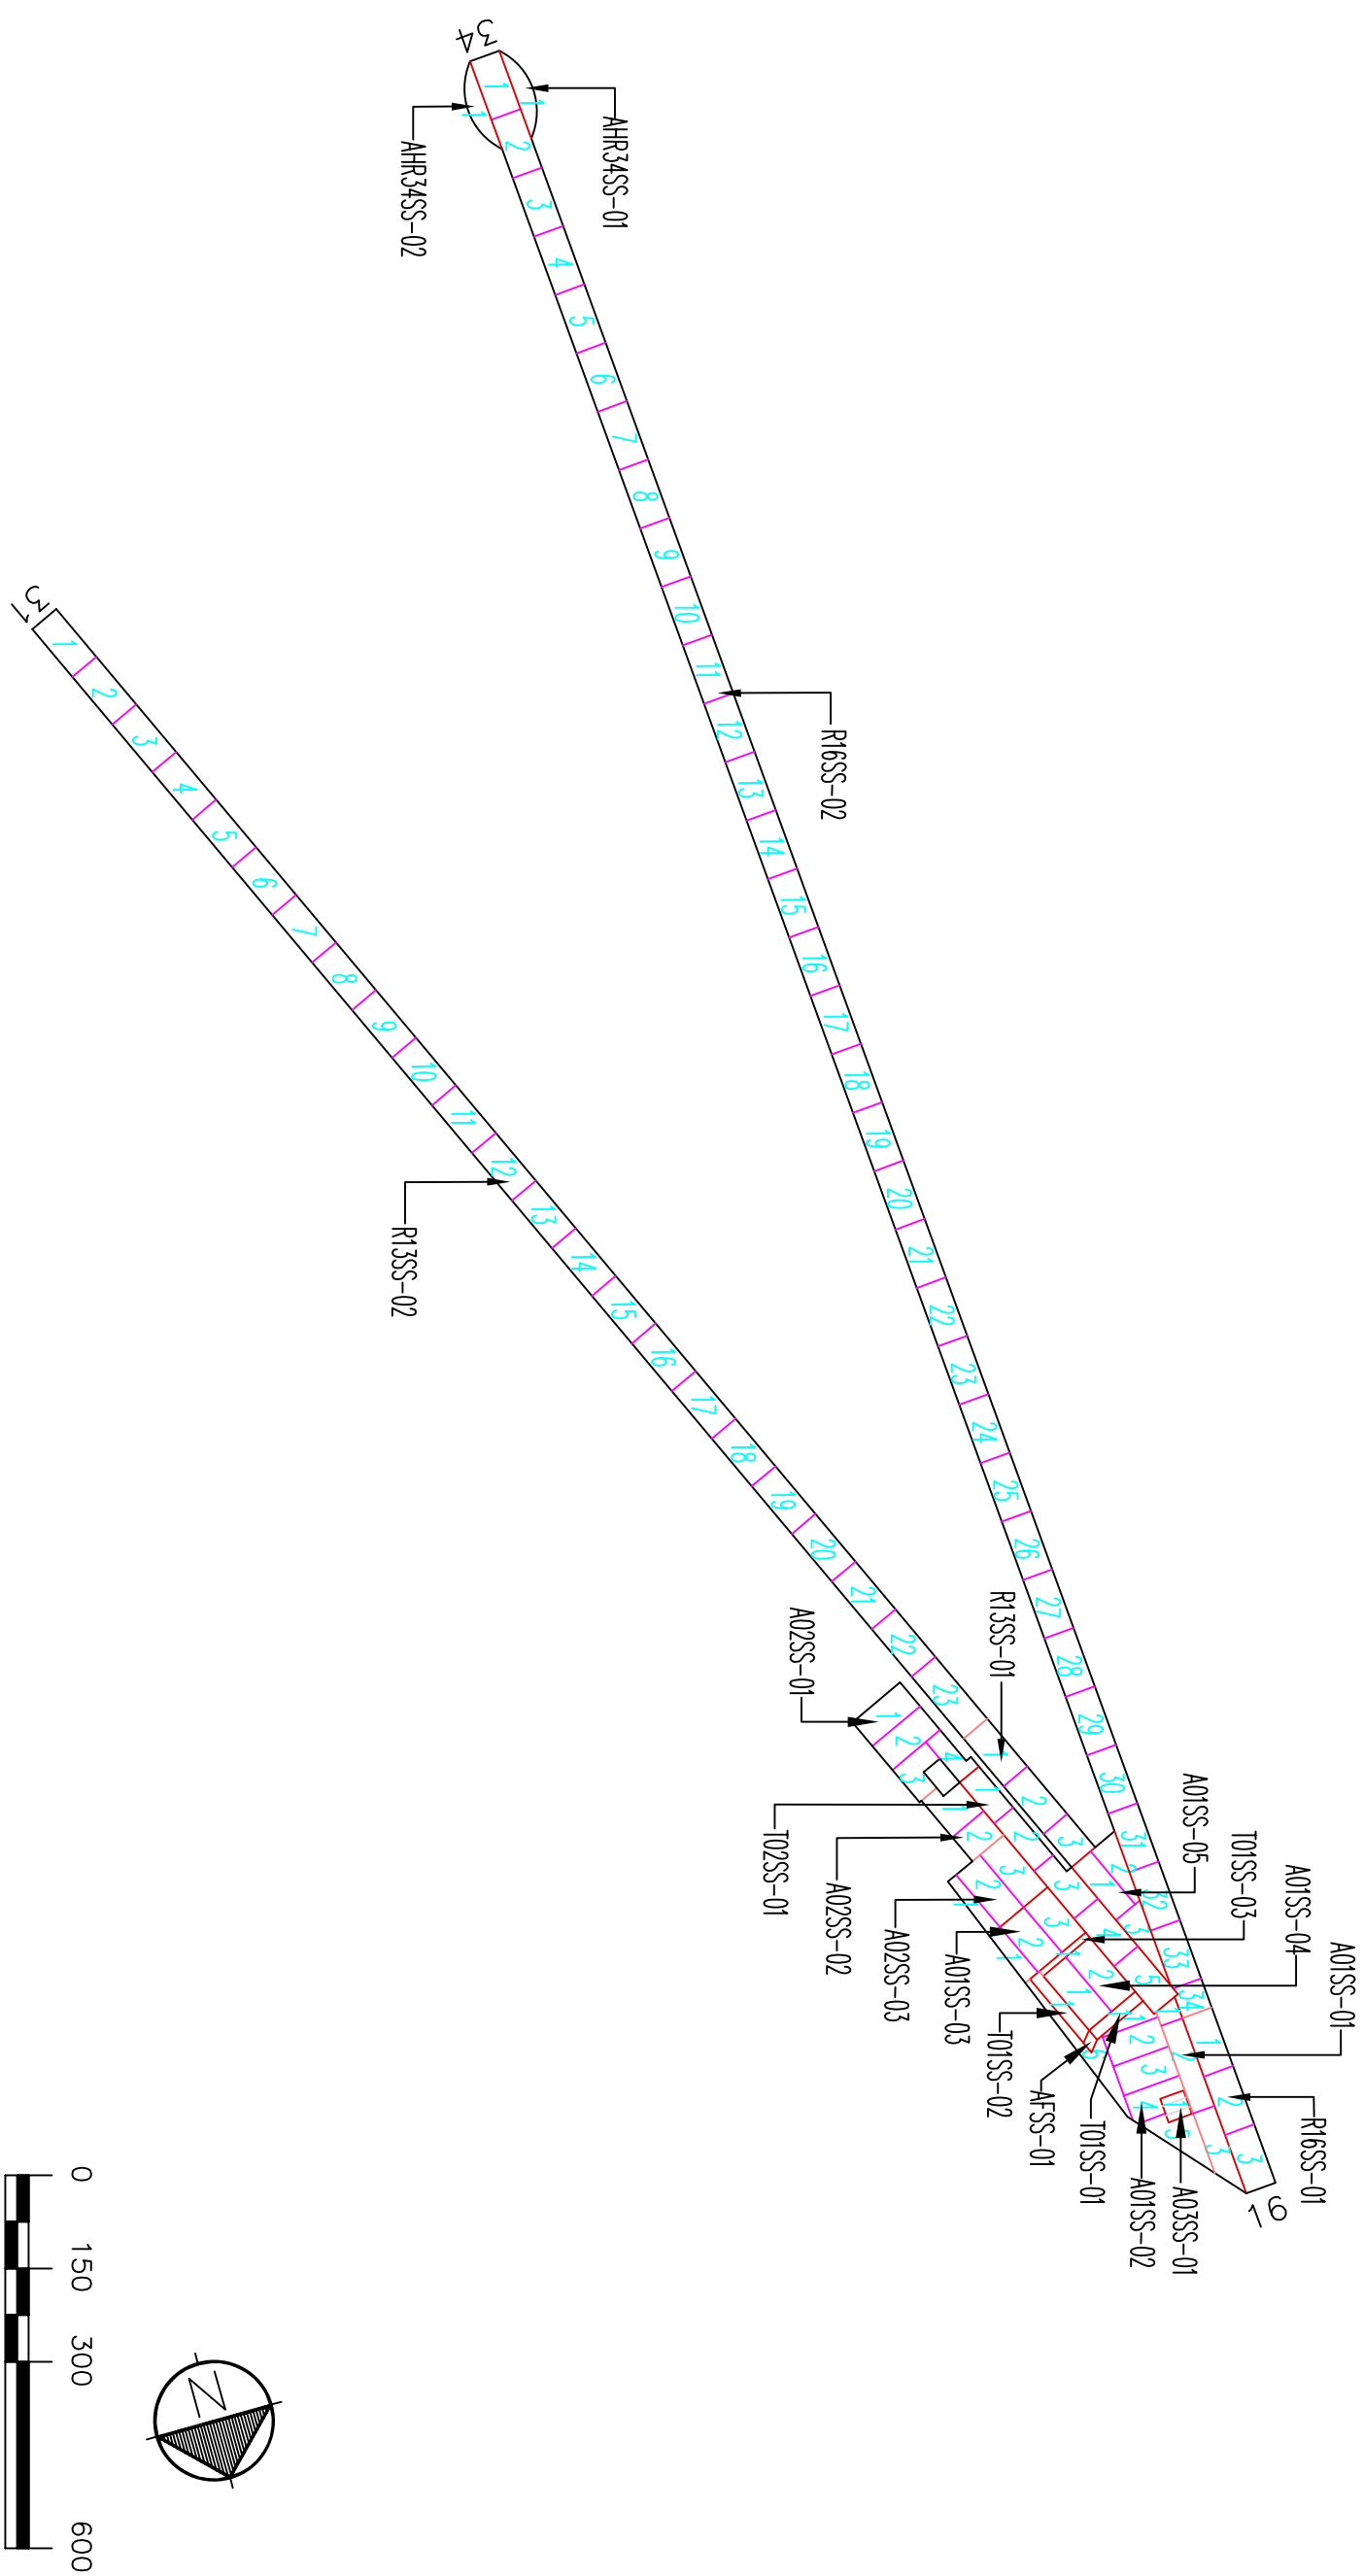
Pavement Branch, Section and Sample Unit Layout.
